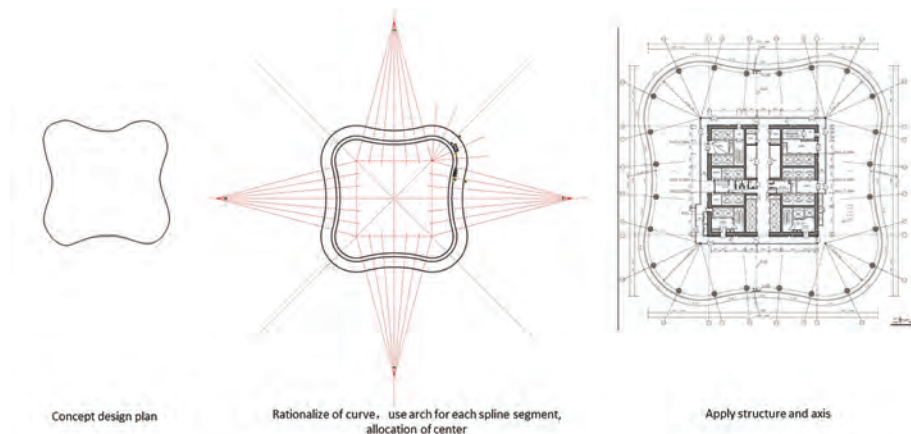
Rationalization of Nanning Tower plan outline (Source: Yu Wang)
